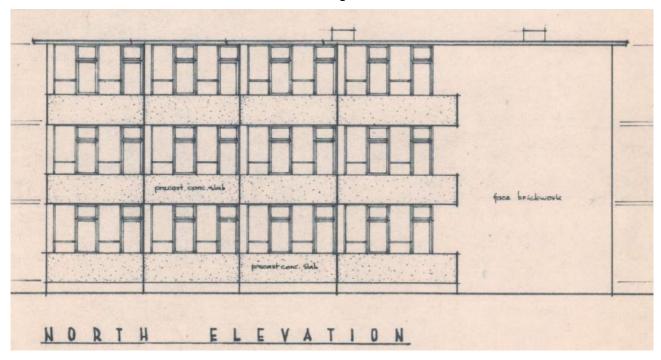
Front or north elevation, Dandenong Road (Source: Council Building File)
